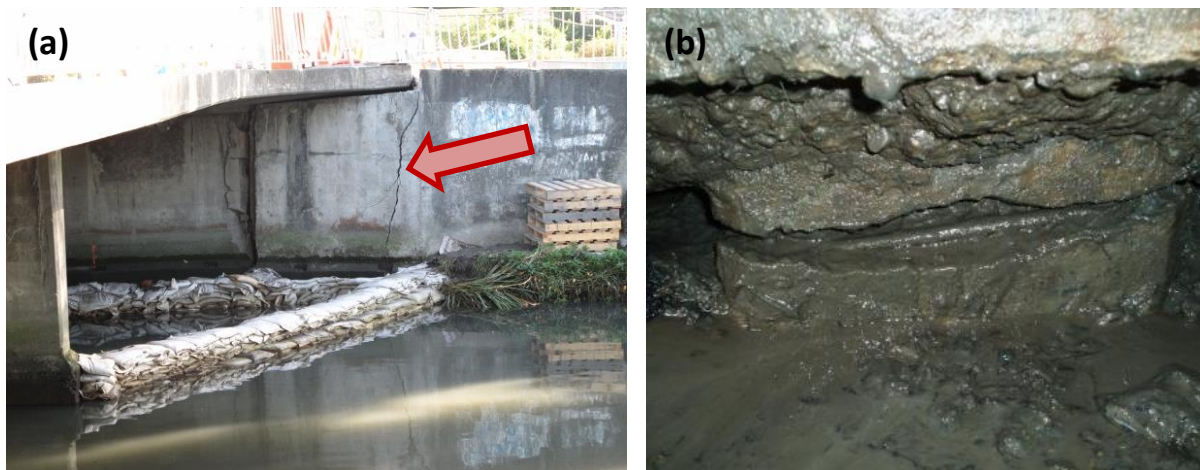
Dallington Bridge, north abutment, (a) vertical cracking in abutment wall, (b) cracking of abutment pile and exposure of transverse reinforcing.
